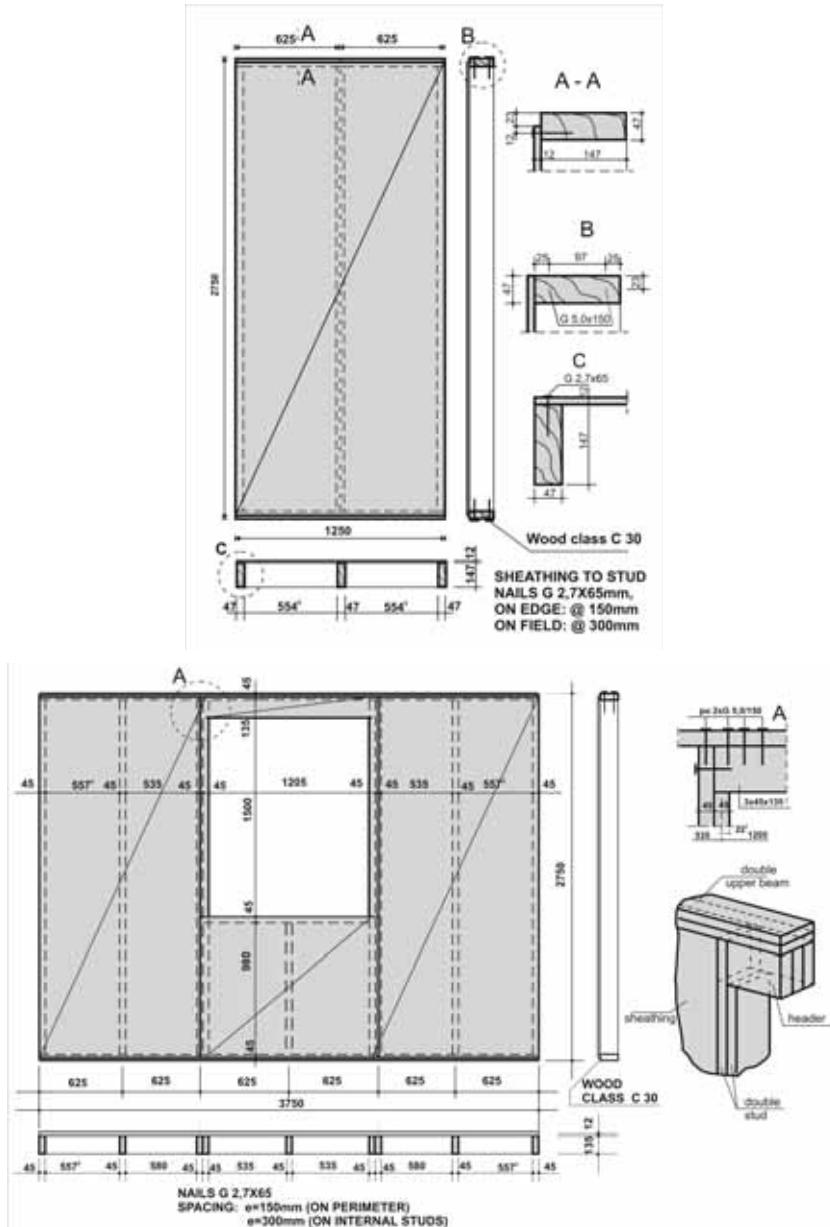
Wall specimen: a) single wall, b) wall with opening
